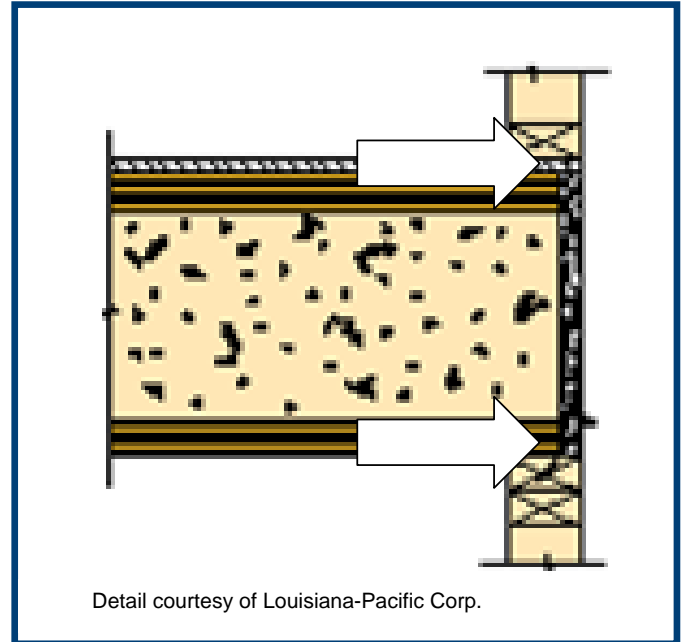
Protecto Wrap® sill plate seal with integral adhesive for an air and water seal
